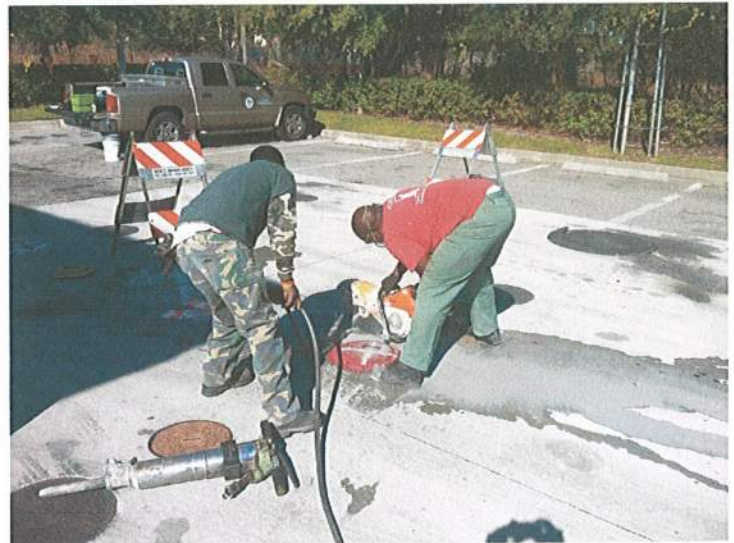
View of the removal of the concrete surrounding the diesel fill bucket
